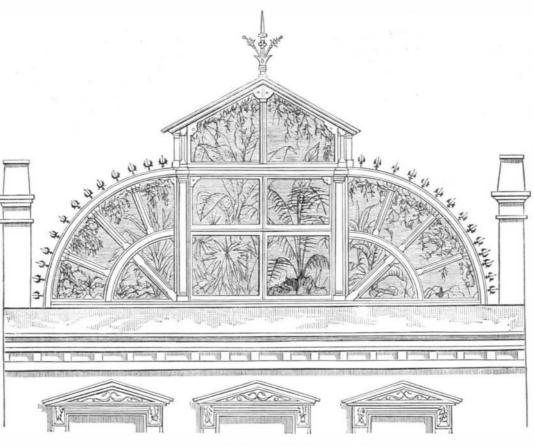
HOUSE TOP GARDEN IN THE CITY.
